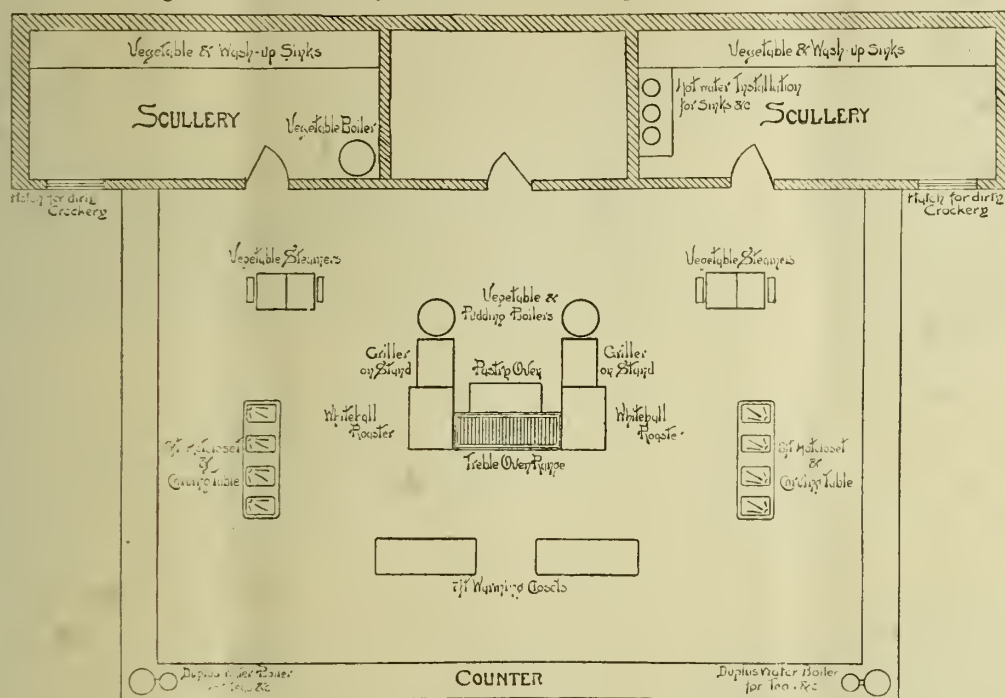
GROUND FLOOR PLAN OF A KITCHEN.
